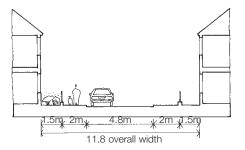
This example of a street hierarchy in a new urban village in Lightmoor Telford, shows how the street width and design of elements within it, such as front gardens or privacy strips, width of footway, tree planting and carriageway width can all contribute to creating a variety of character, even with similar building heights
